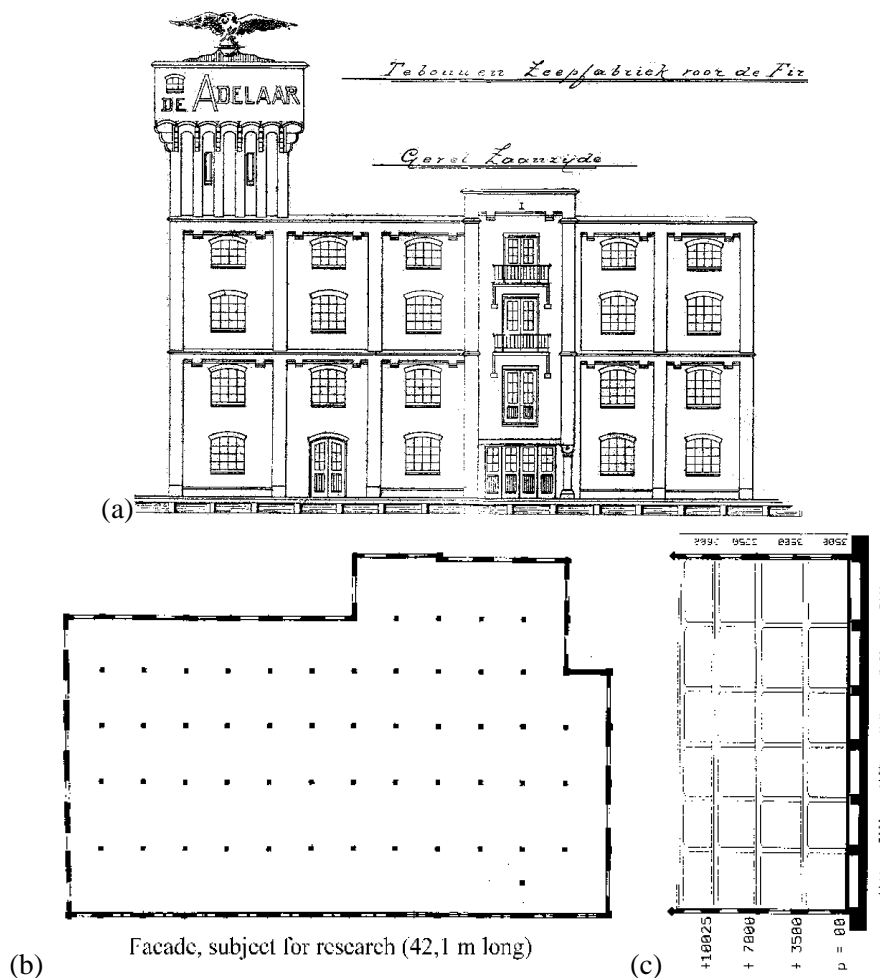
'De Adelaar' soap factory (a) façade facing the river Zaan, (b) plan showing outer unreinforced masonry walls and inner RC column grid and (c) elevation showing the RC floor and roof slabs.
